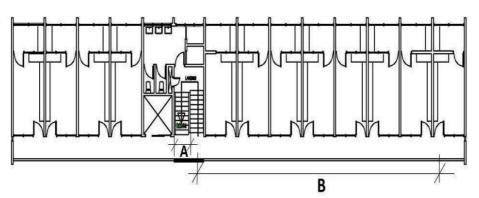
Typical floor plan of Halls of Residence showing width of stair and maximum travel distance
